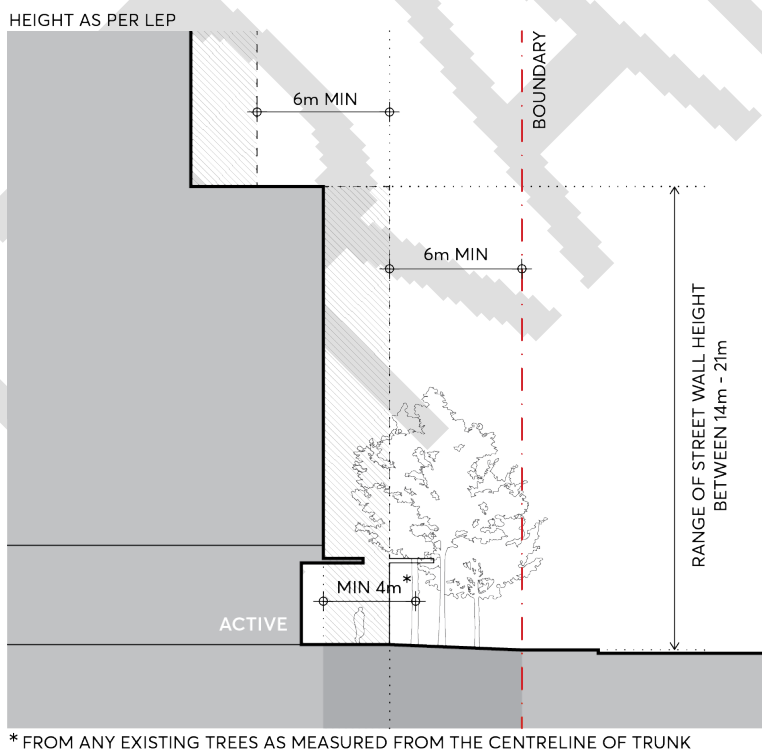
Campbell Street (Section B) Setbacks and Street Wall Height
